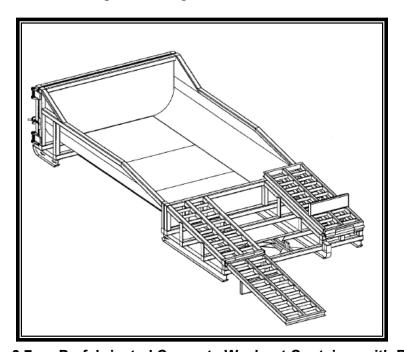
Prefabricated Concrete Washout Container with Ramp.
